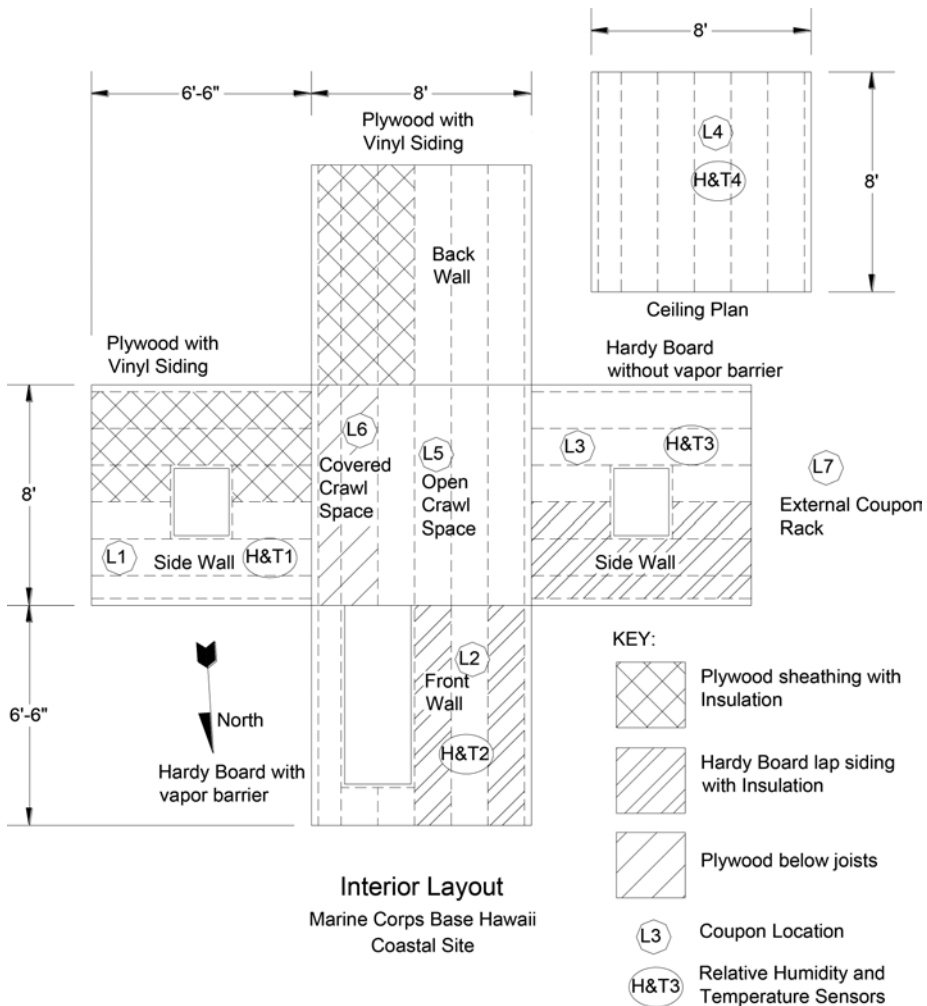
Typical wall layout to study corrosion within walls, floor and ceiling with different exterior coverings.
